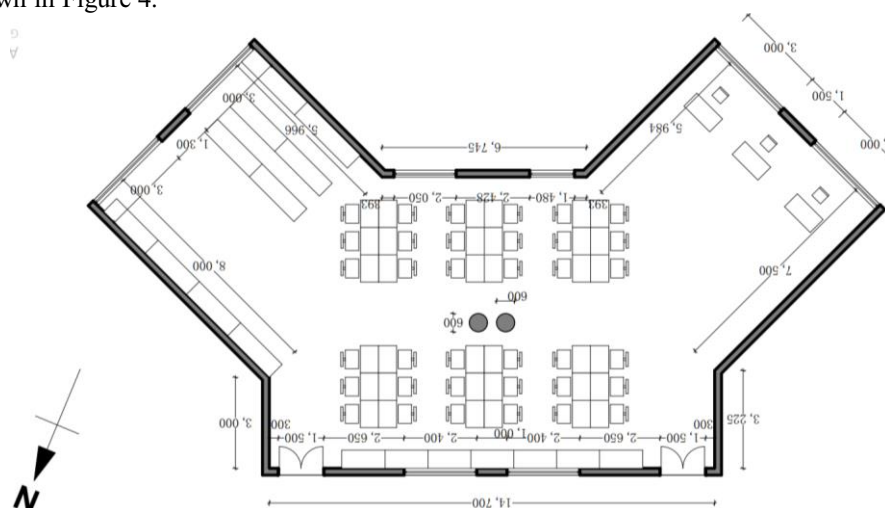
Floor plan of ESUT-HALL C (216.8 m sq, WFR = 15%) Source: Author’s fieldwork
